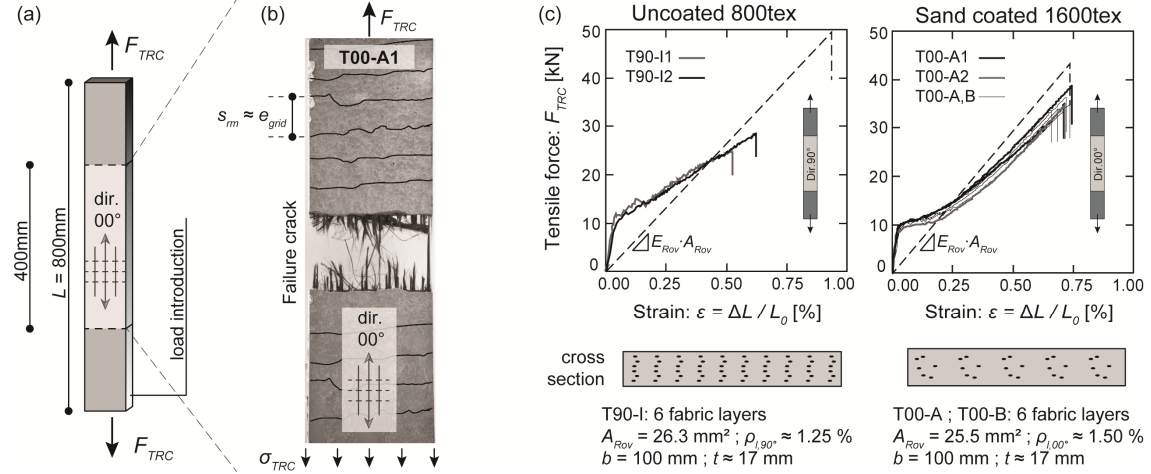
Tensile response of textile reinforced concrete: a) specimen, b) crack pattern and failure, c) force-strain curves and cross-section layout.
